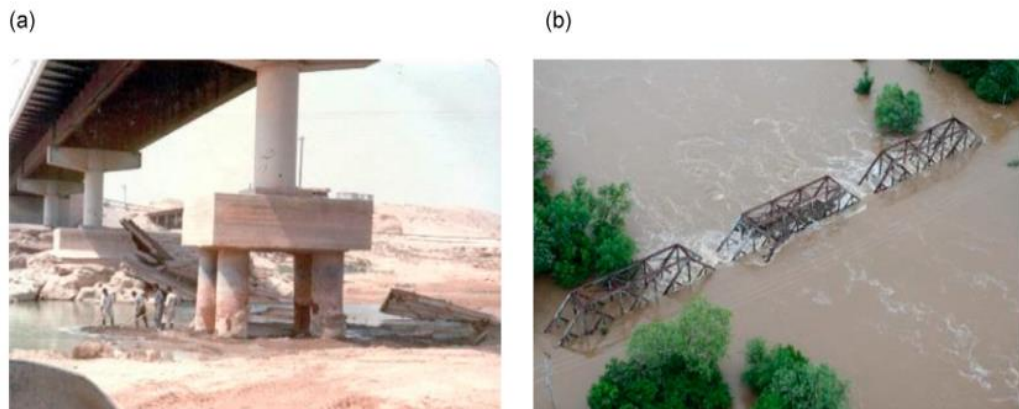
Bridge failures due to hydraulic. (a) Foundation scouring. (b) Bridges submerged by flood (Zhang et al., 2022)
